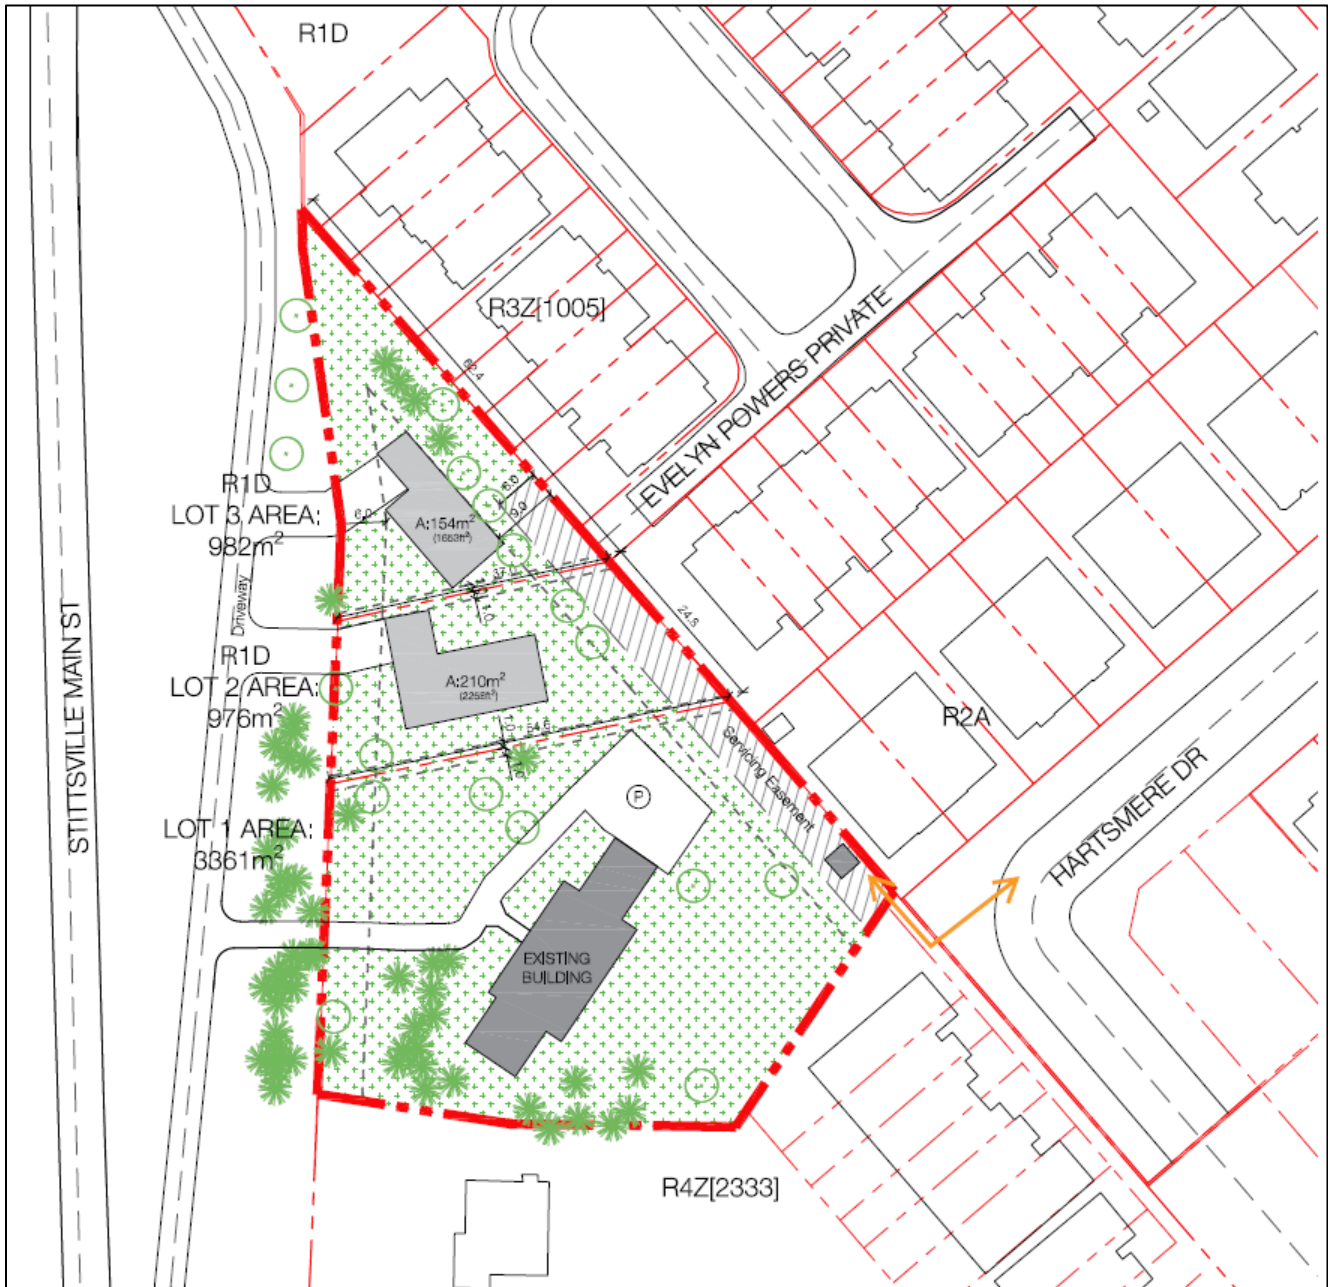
Concept Plan showing proposed lot configuration and potential building footprints
